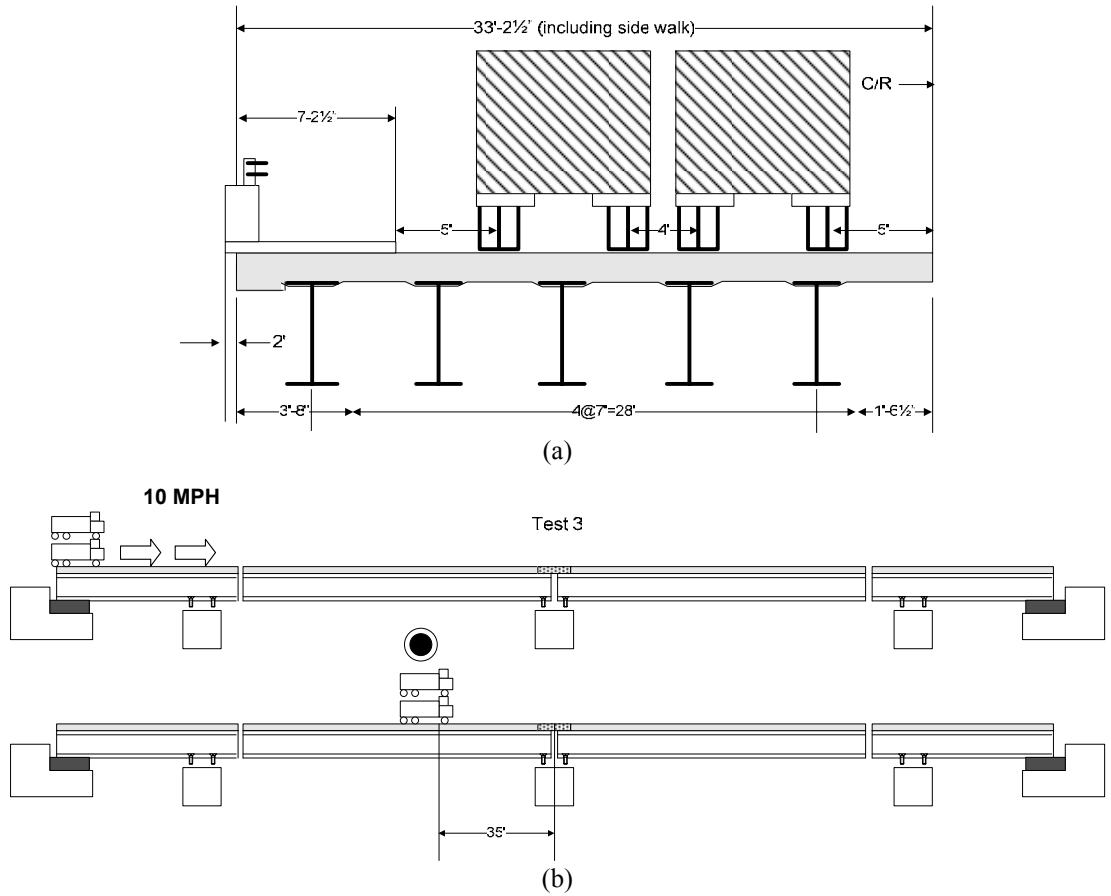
(a) Transverse truck location of Test #3; (b) Load plan for Test #3
